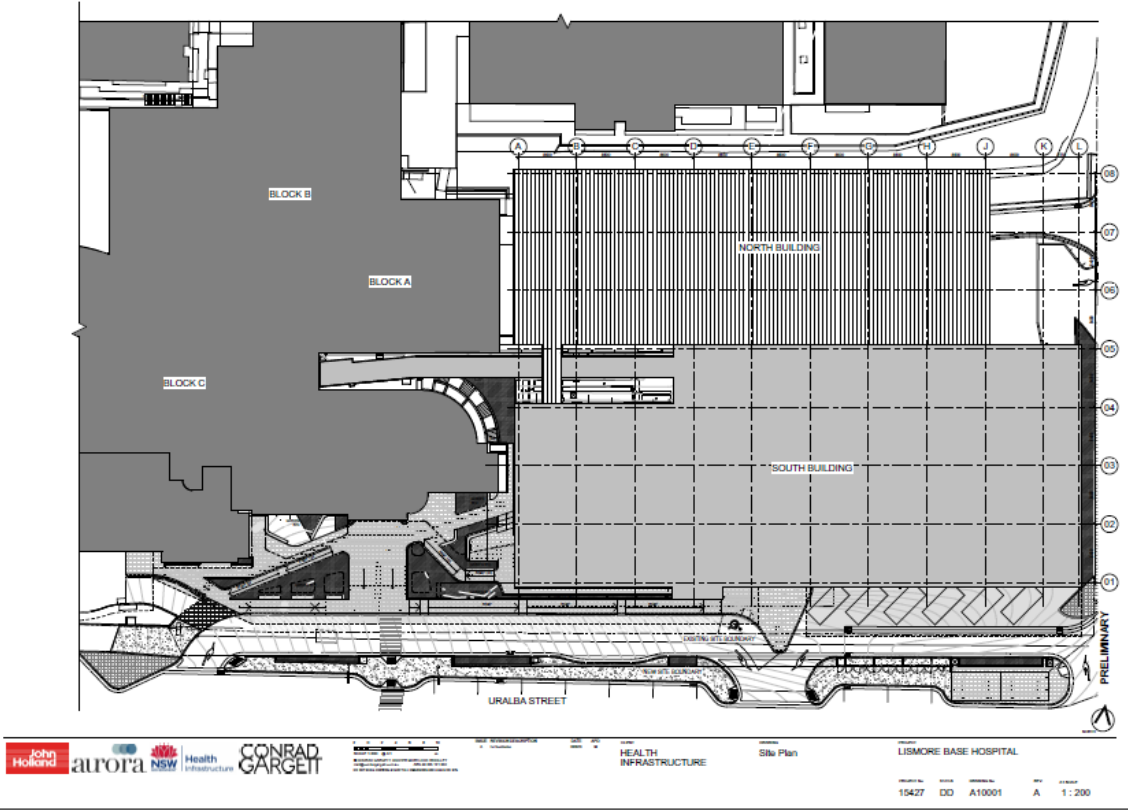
Overlay of Stage 3B1 South Tower and 3B North Tower Buildings
